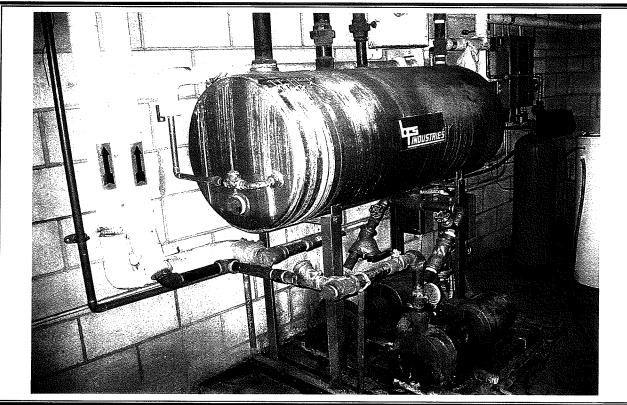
Photo Date 12/05/06 McCurdy Building Boiler feedwater tank was leaking and has patches on it.
